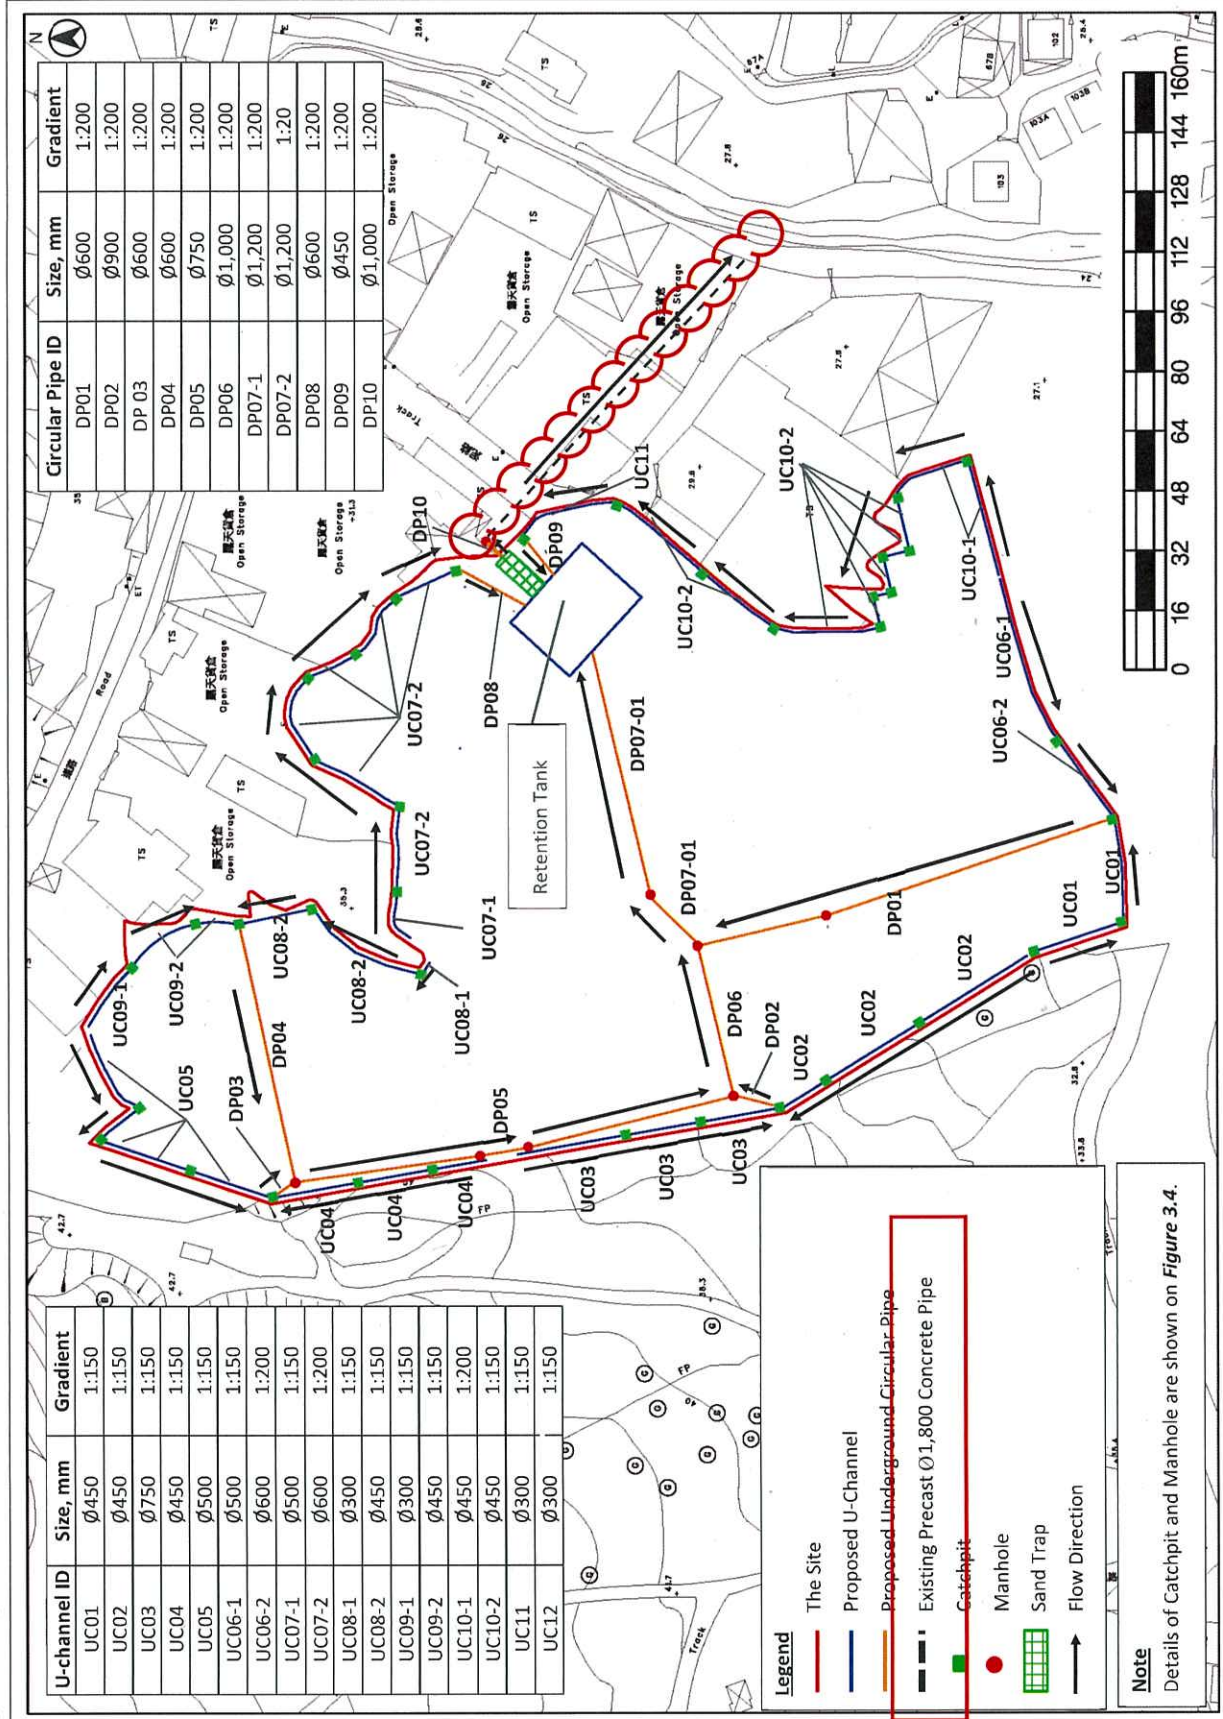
Proposed Drainage Diversion Layout (Sheet 2 of 2)
